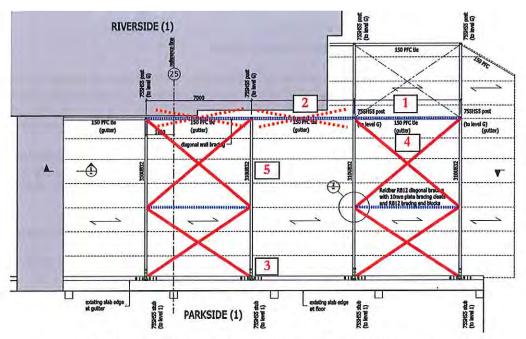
Concept 67 % DBE strengthening scheme for the Emergency Department Extension (IL4)
